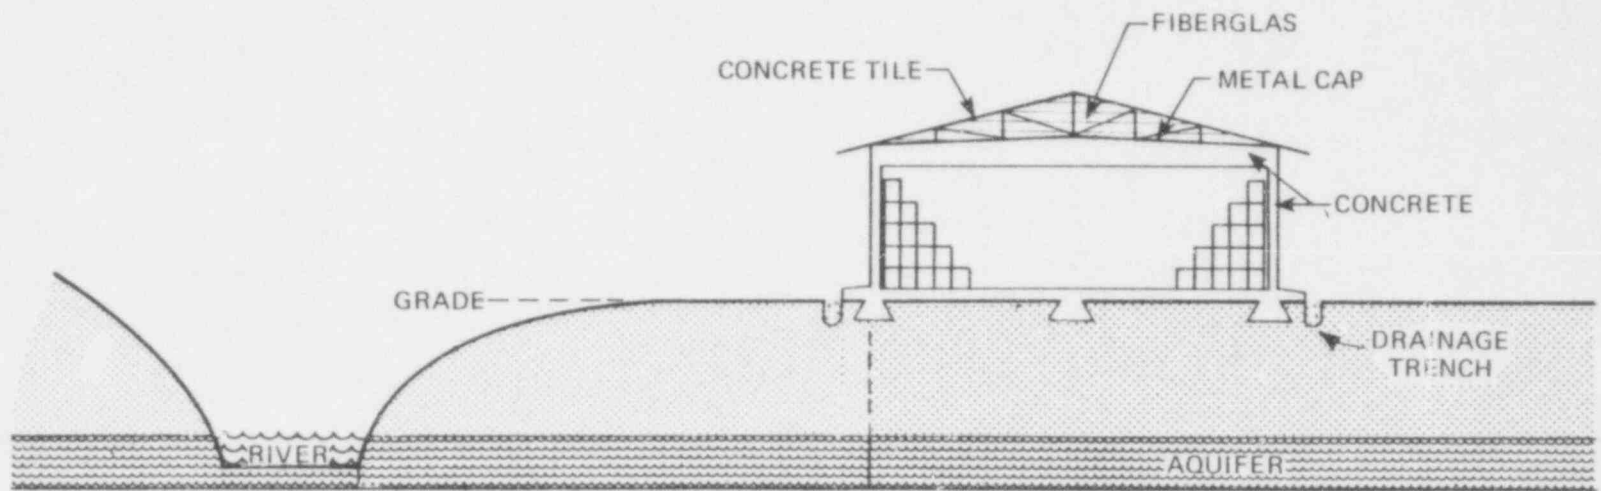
EXPOSED STRUCTURAL DISPOSAL FACILITY
